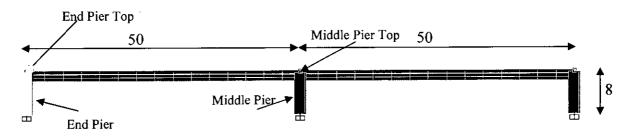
Bridge Elevation (Straight Bridge) (All dimension in meter)
